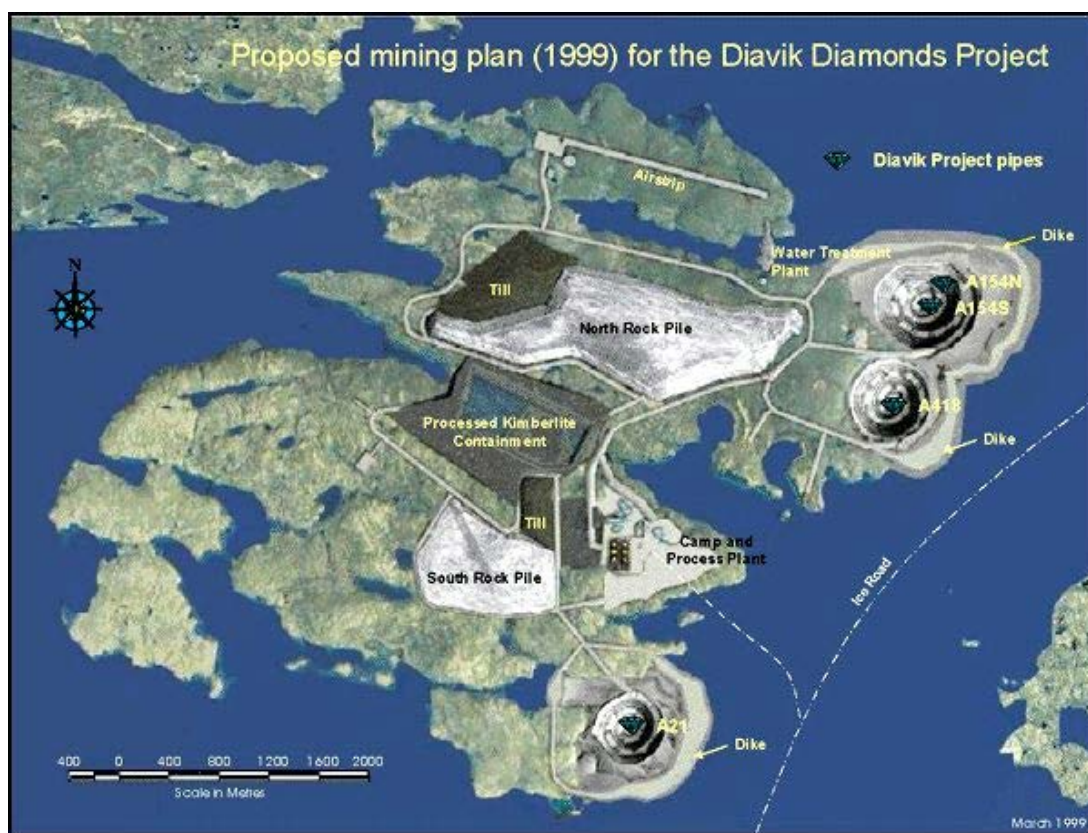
General Diavik site layout, showing A21 pit and dike alignment as envisioned in the 1999 feasibility study.
